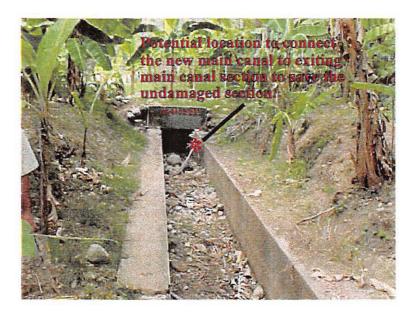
Potential site to connect the new main canal to exiting main canal to save the existing main canal and the closed conduit.
